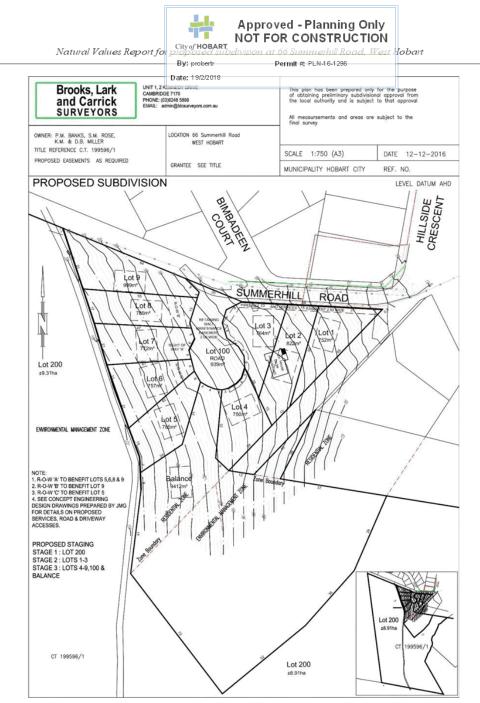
Subdivision proposal (reproduced from Brooks Lark and Carrick Subdivision Plan).
